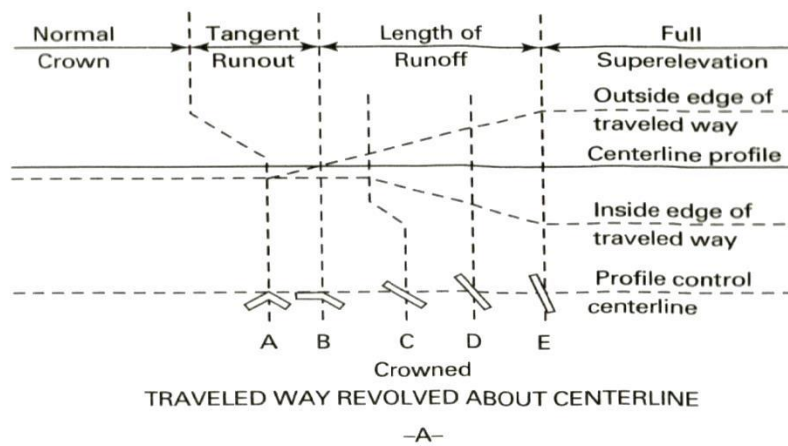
/1: Methods of Attaining Superelevation [2. p.180]
